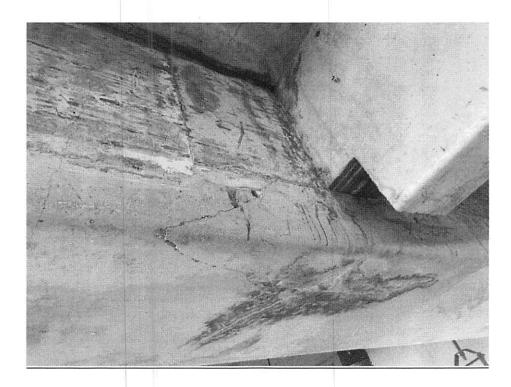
Spalling and Cracking on a soffit beam at a joist support.
